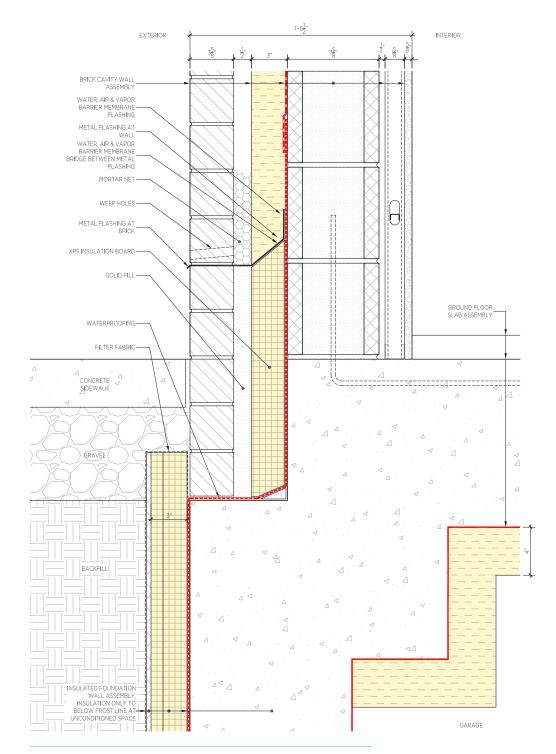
Base case Building - Brick cavity at grade with foundation wall and ground floor slab
